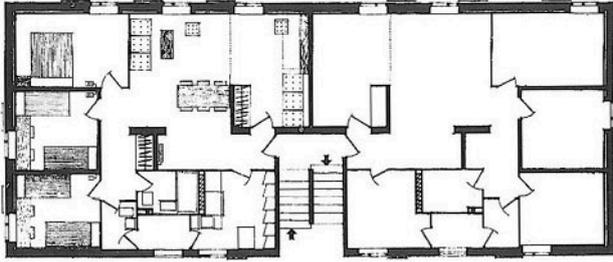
Batán*, 4-bedroom apartments. Floor plan.
